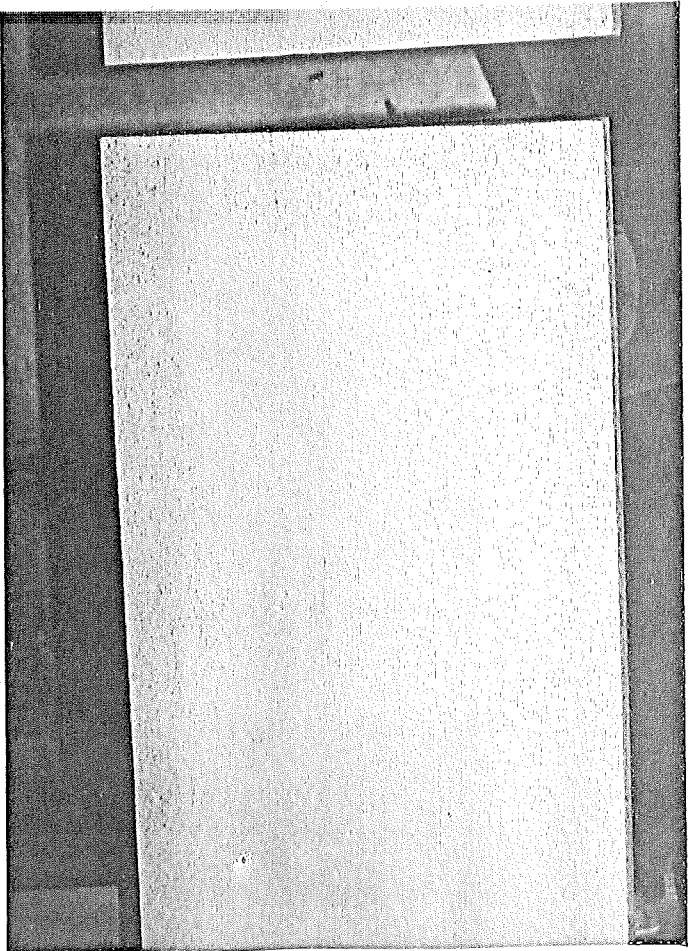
Condition of flange pictured in Figure 22 after a second blasting.
